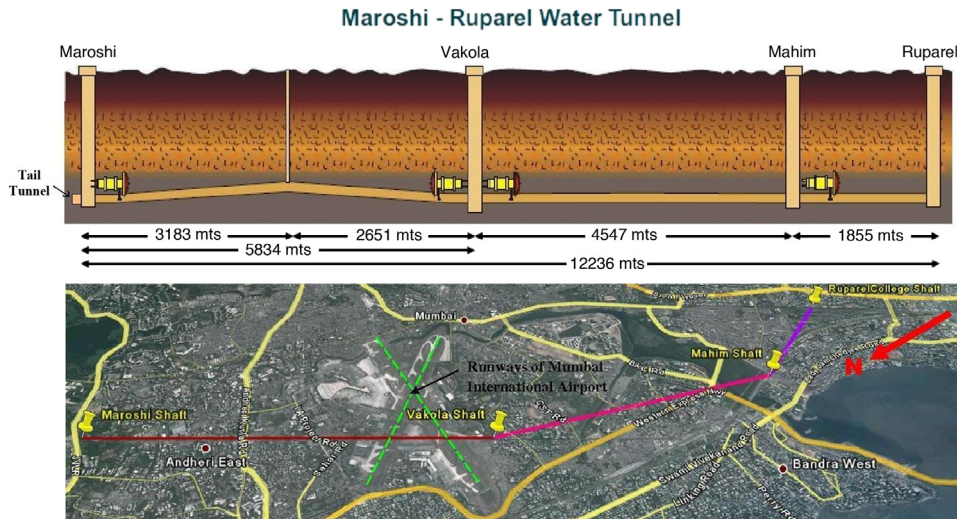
Longitudinal section and plan of tunnel from Maroshi to Ruparel College.
